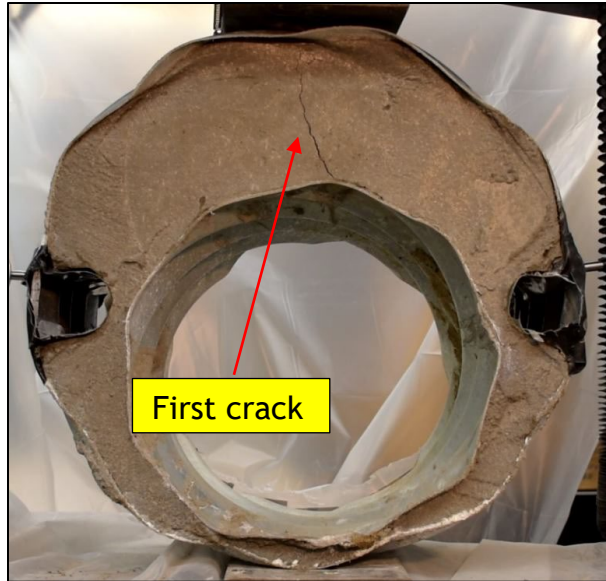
First Crack in a Sliplined Culvert with Voids at the Springline.
